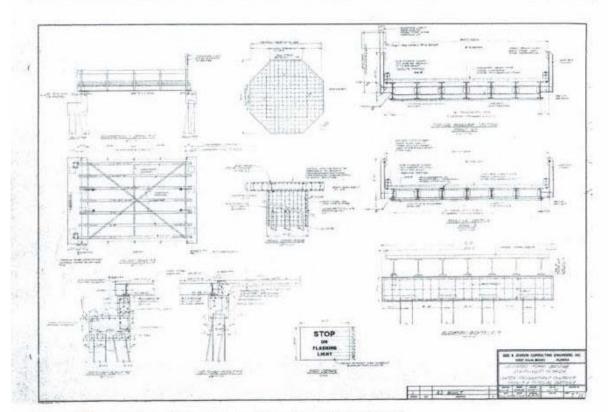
Sharpe's Ferry Bridge Approach Span 3 and Typical Details
